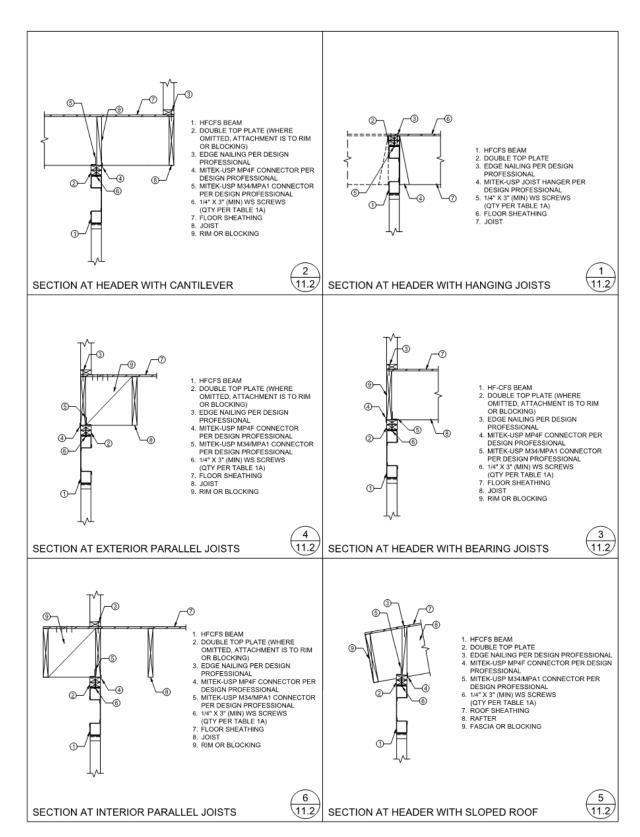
ADDITIONAL INSTALLATION DETAILS
